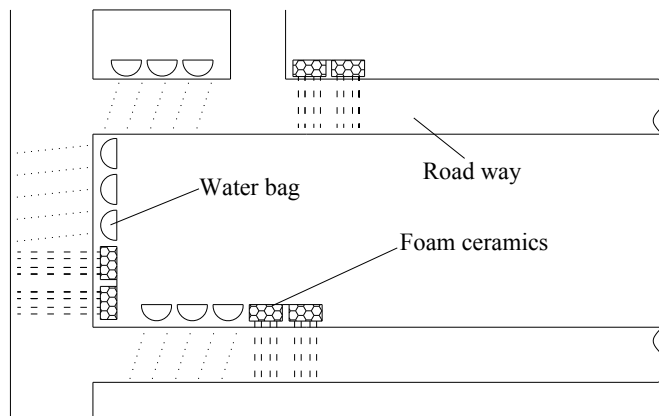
Arrangement of water barriers and porous medium in mine roadways
